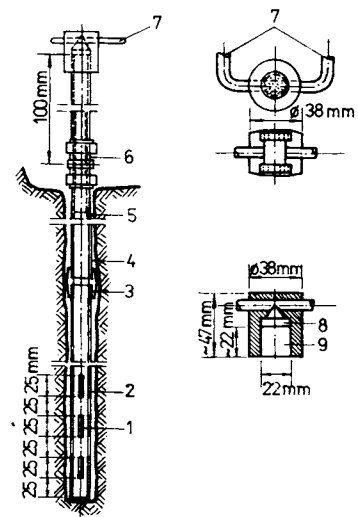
Hydraulic-transducer piezometer. 1 — perforated end, 2 — loose earth fill, 3 — coupling, 4 — clay stopper, 5 — plastic tube, 6 — elastic coupling, 7 — plastic tube, 8 — recess for sealing ring, 9 — hole for inserting the joining piece.
